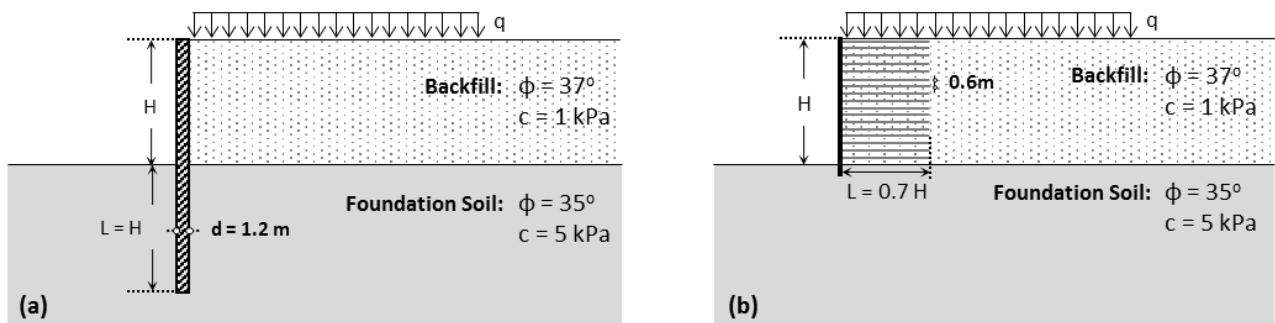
Geometry of the examined retaining systems: (a) conventional bored pile wall and (b) Mechanically Stabilized Earth
